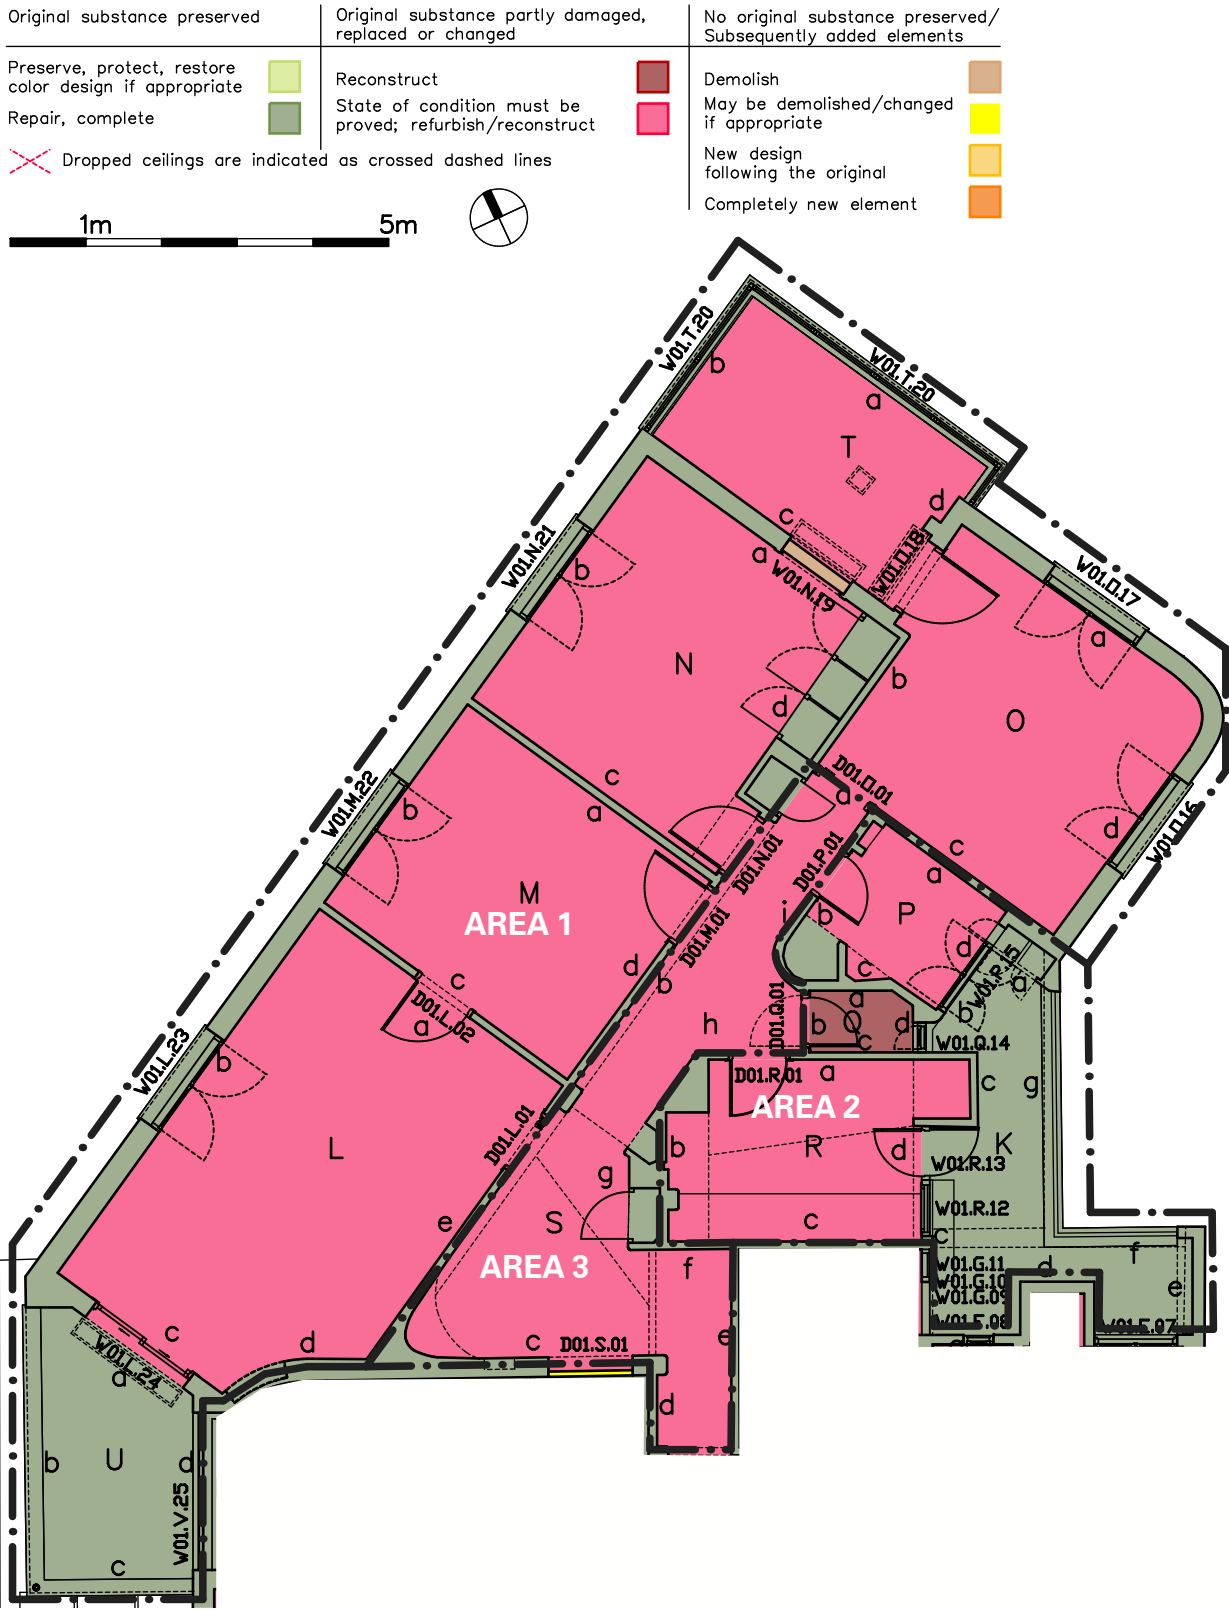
2nd floor, apartment 2, preservation measures, walls and floors
